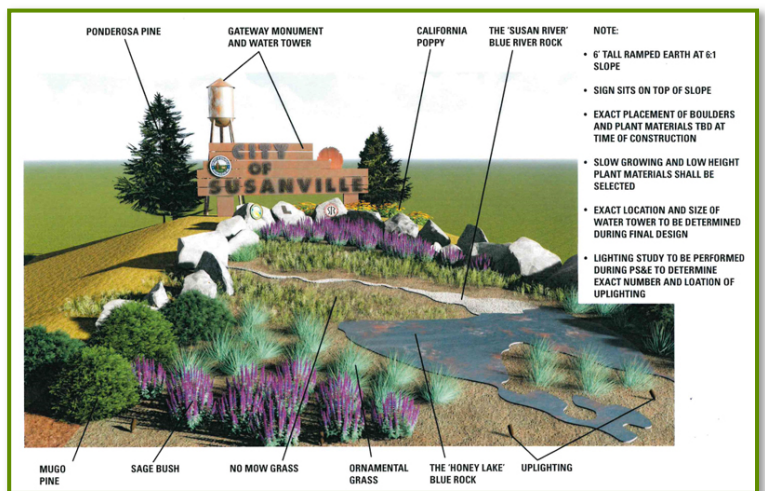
Susanville Southeast Gateway Proposed Monument
